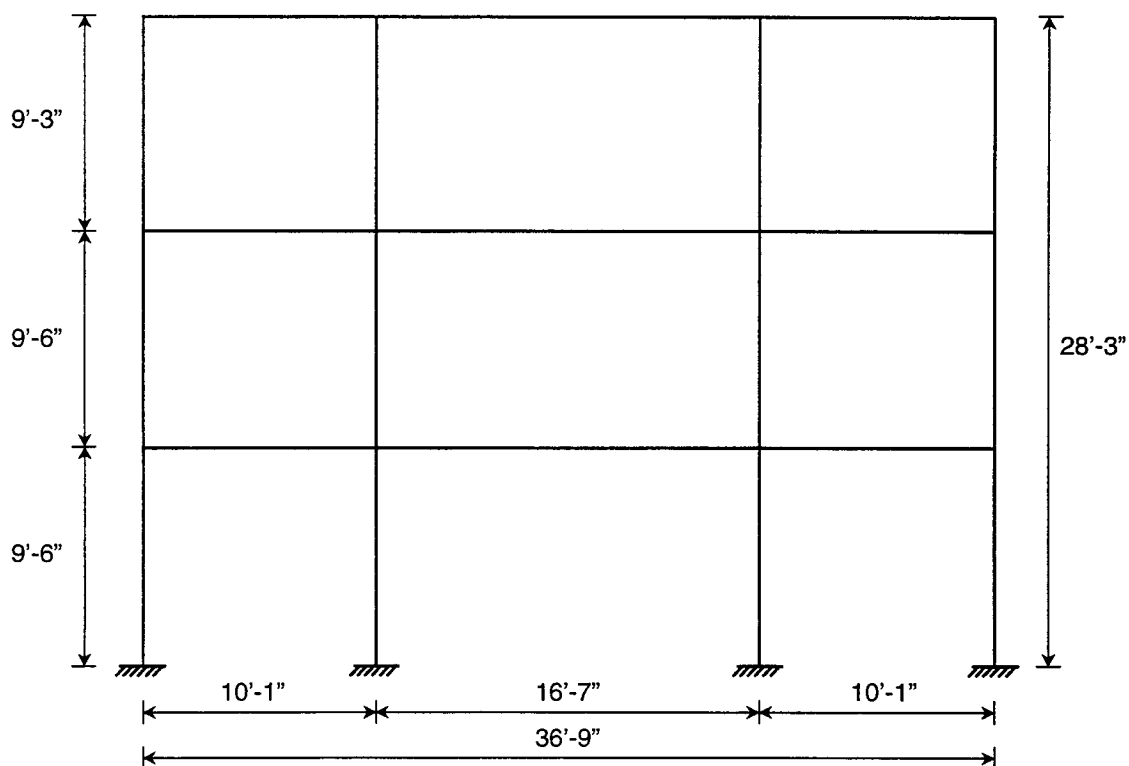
(a). Elevation of Study Structure 1: slab-column frame
